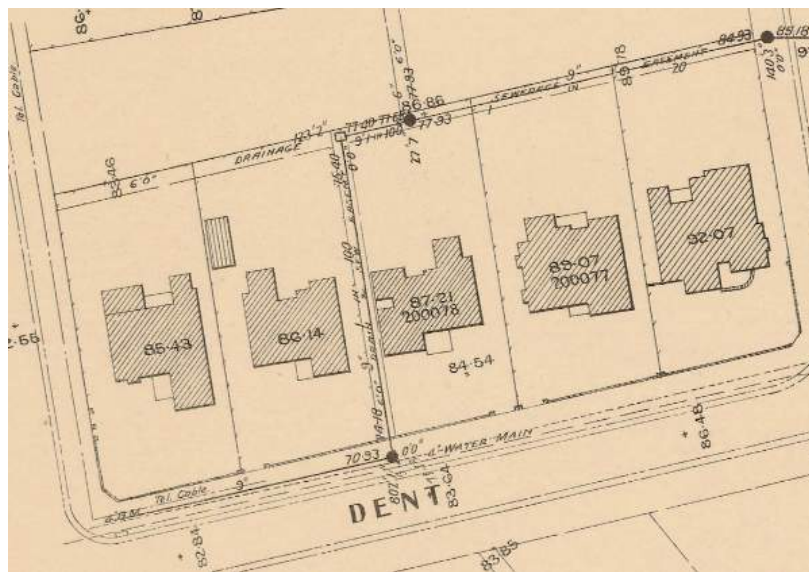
Detail of the previous figure showing five houses constructed by 1937 at 20 to 28 Dent Street.
